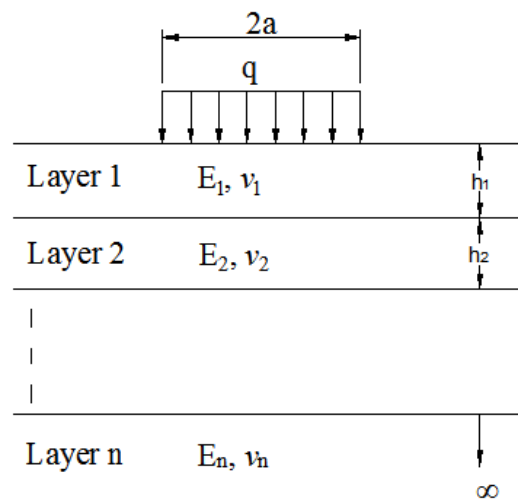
Multi-layered Pavement Structure Subjected to a Circular Loading (Huang 2003)
